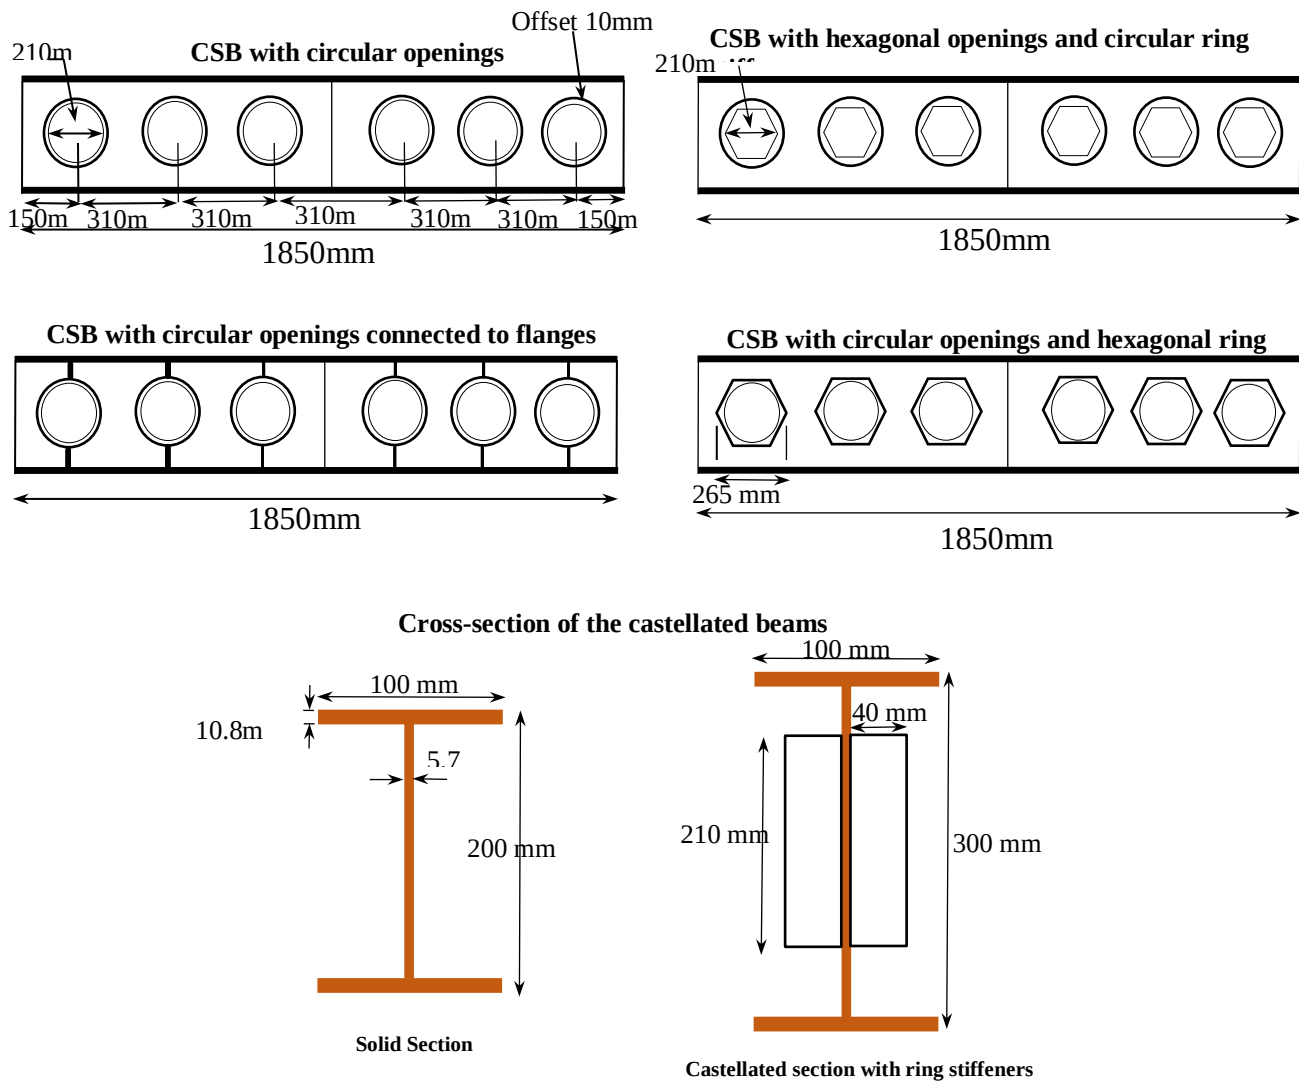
Geometry and Stiffener Configurations of the Proposed Castellated Beam Models
